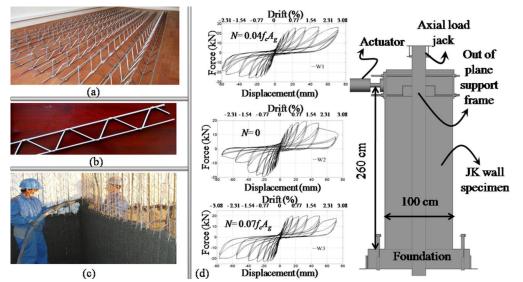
(a) JK panel, (b) JK stiffeners, (c) injection of EPS concrete into the JK panel, and (d) hysteretic behaviors of JK walls with different gravity loads, after Mousavi *et al.* (2014)
